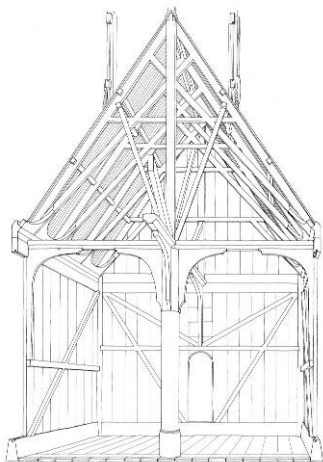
Church in Nes, reconstruction of a perspective view of the interior on the western wall. Source: [3]
